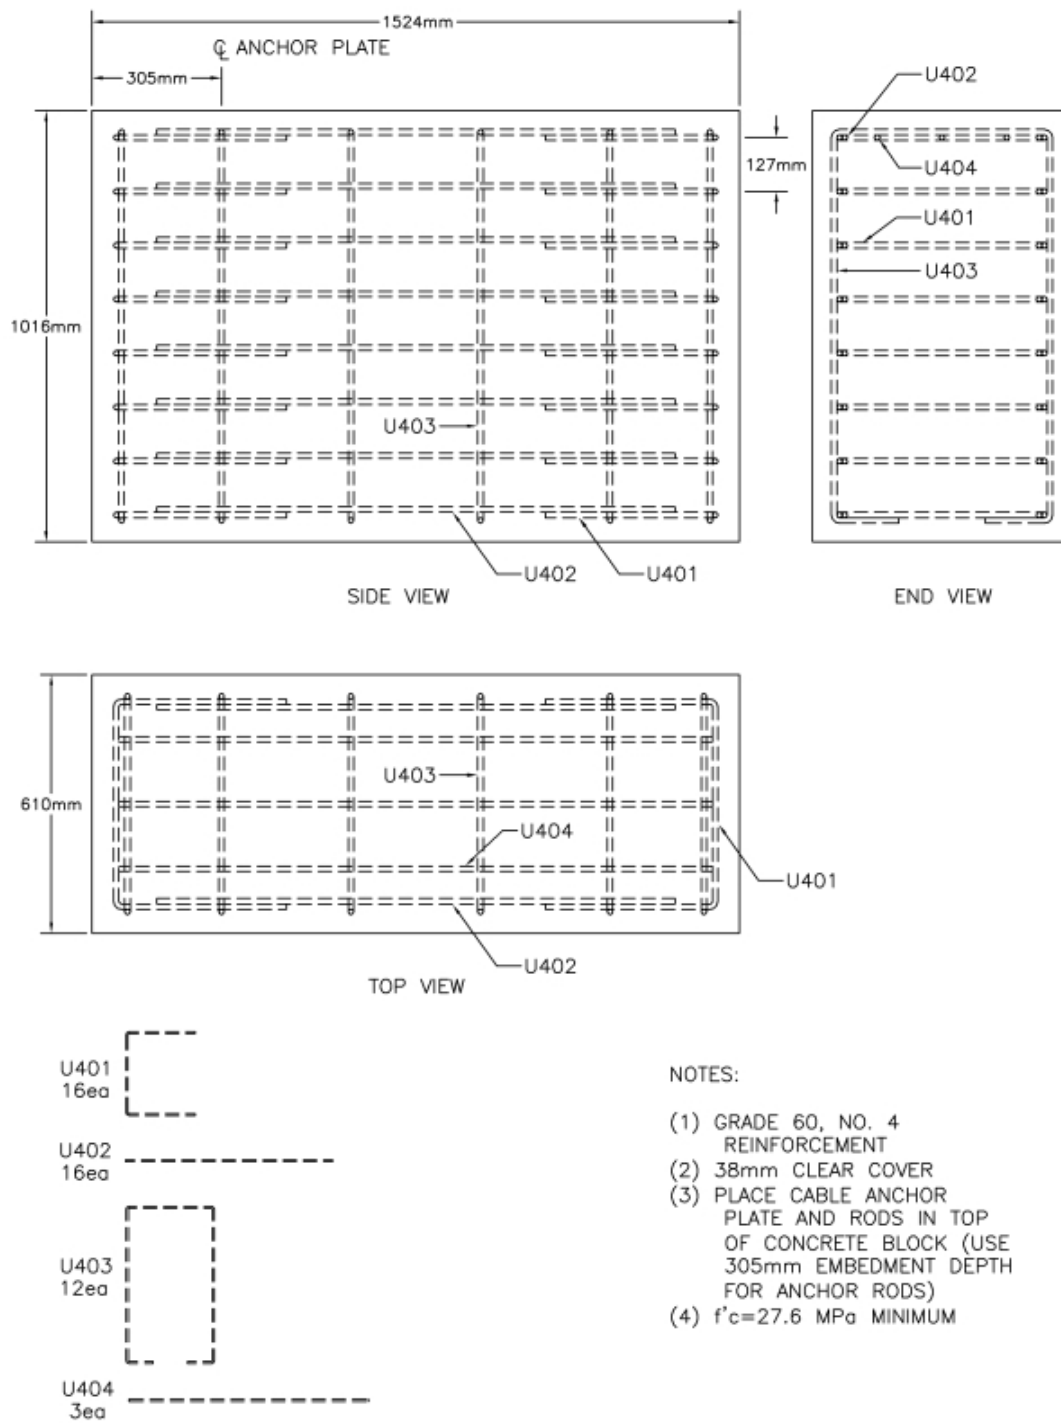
Design Option No. 1 – Reinforced Concrete Block
